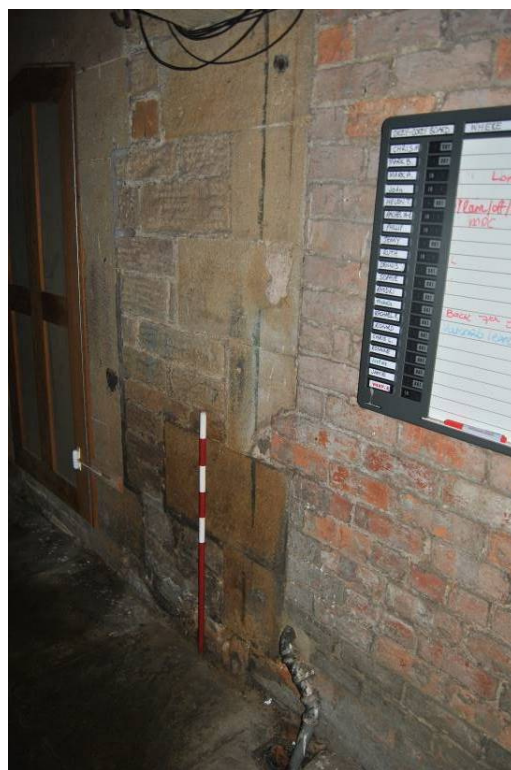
Ashlar quoins forming western jamb of door abutted by inserted brickwork to north of stables (extension C).
